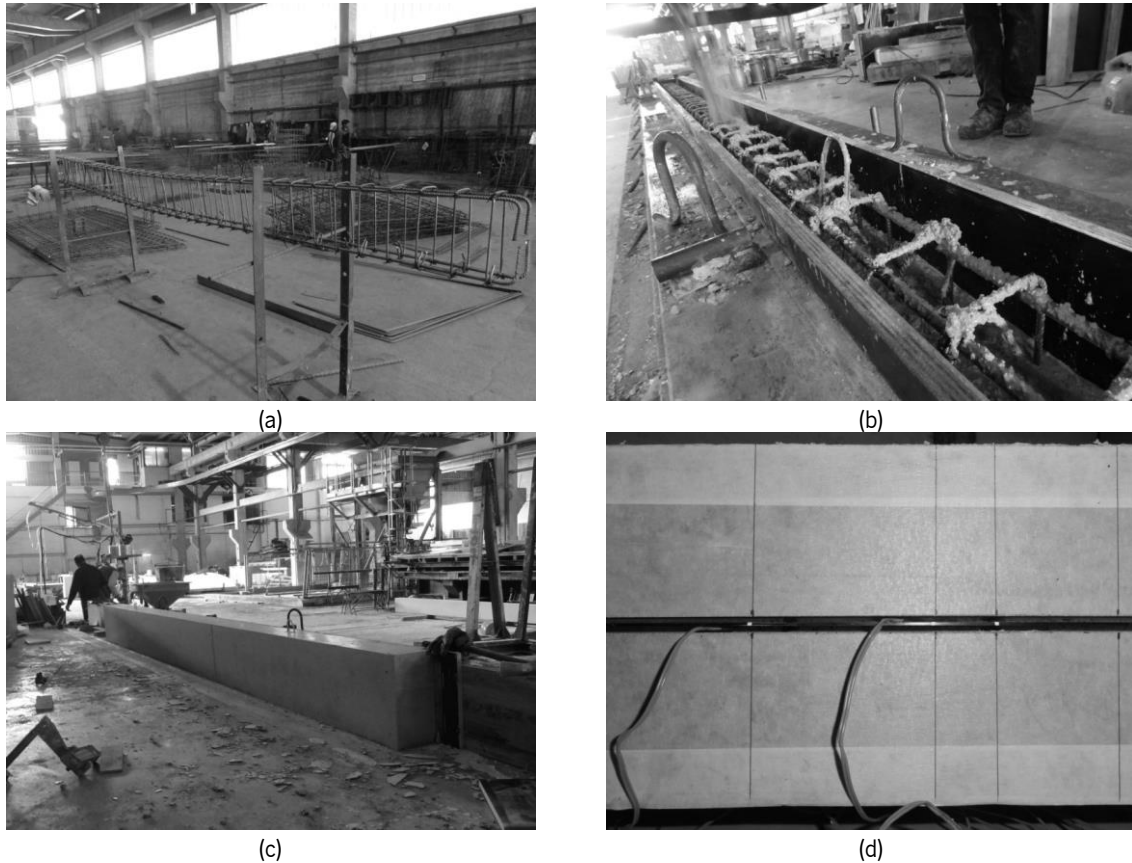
Casting and preparation of the beams – Series II: (a) steel reinforcement, (b) casting (c) finished aspect of a beam and (d) prestressed CFRP before the application of the epoxy adhesive.
